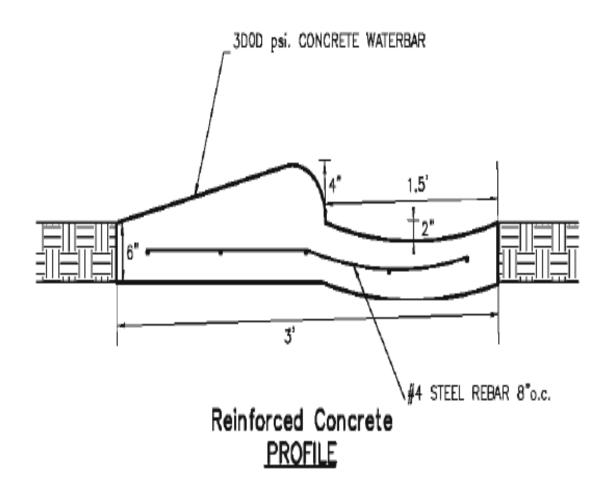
Concrete swale (for when drainage channels begin above the elevation of the road and must cross it perpendicularly)
